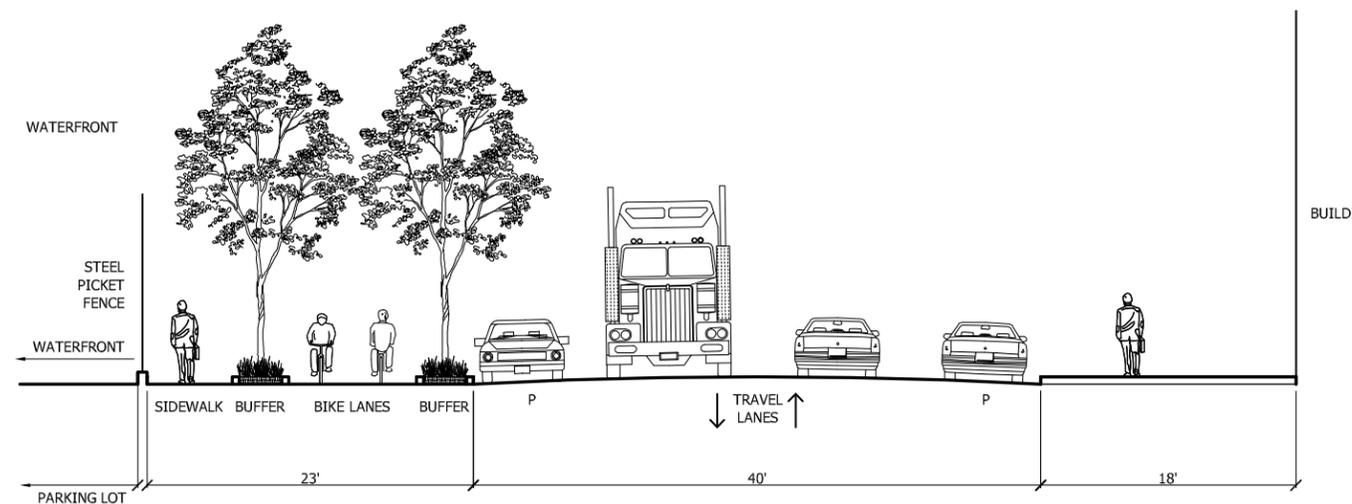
Possible configuration for Second Avenue between 58th Street and Wakeman Place
